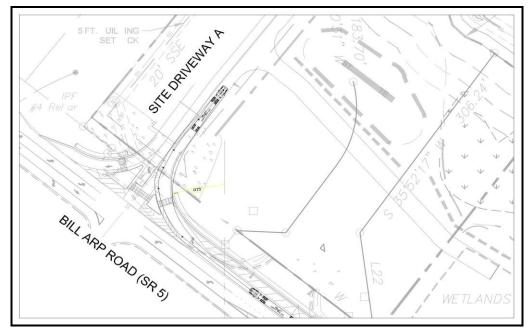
Bill Arp Road (SR 5) at Site Driveway A – Northbound Right (Entering Truck)
